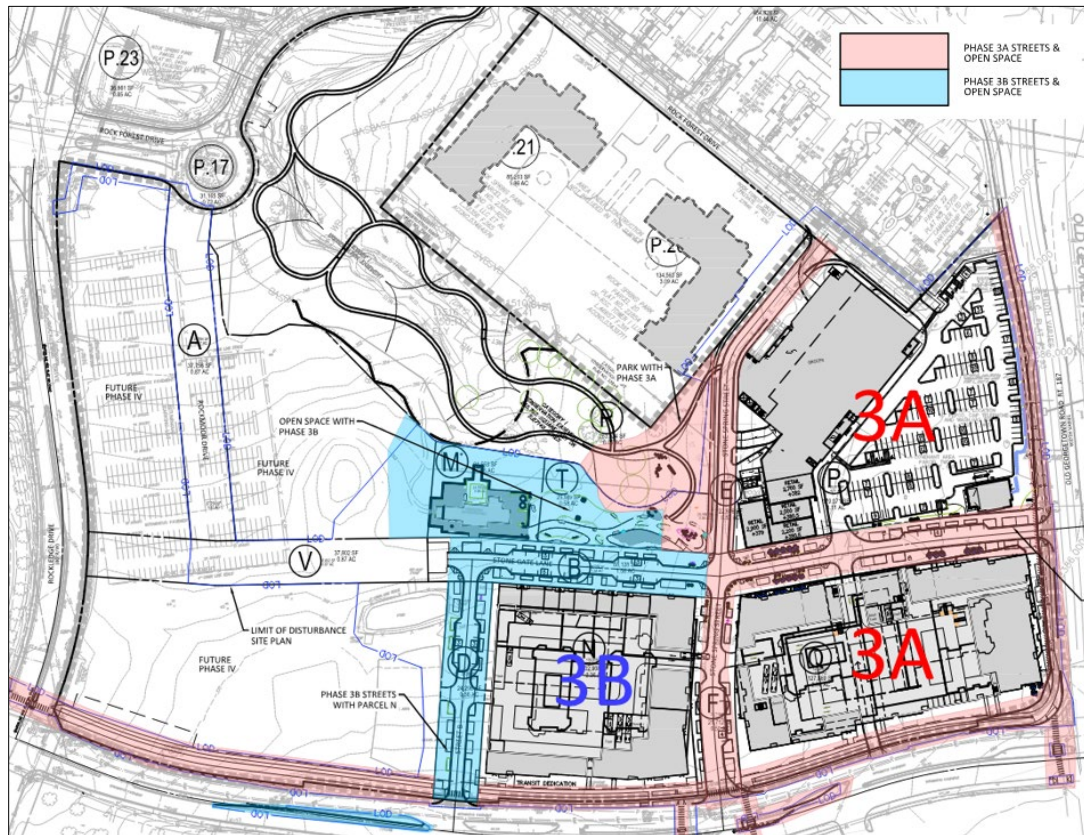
Phasing Plan (Future Phase 4 will require a Site Plan Amendment)
